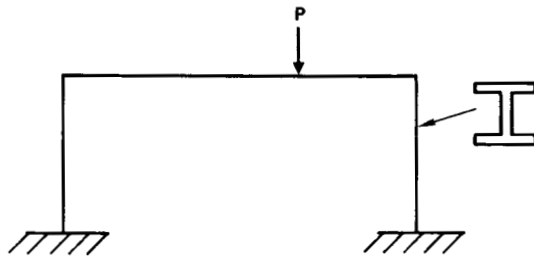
PLANE FRAME SUBJECTED TO POINT LOAD
